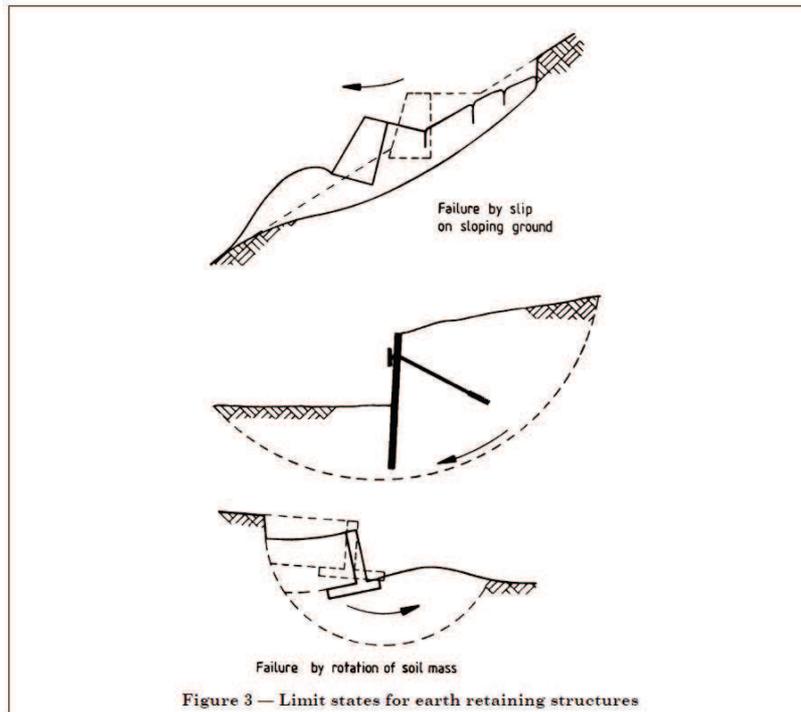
Retaining wall limit state: extract 1 from BS 8002:1994 [4]
